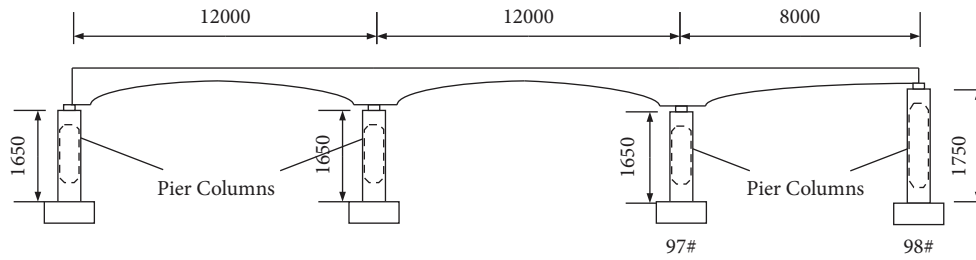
Elevation of a three-span continuous bridge (unit: cm).
